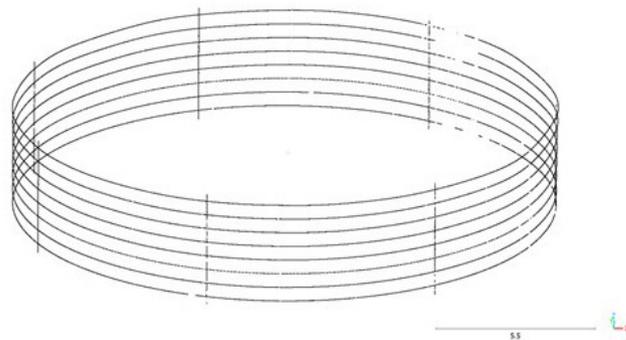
Extracted horizontal and vertical sections from Tank-2 cylinder point cloud.
